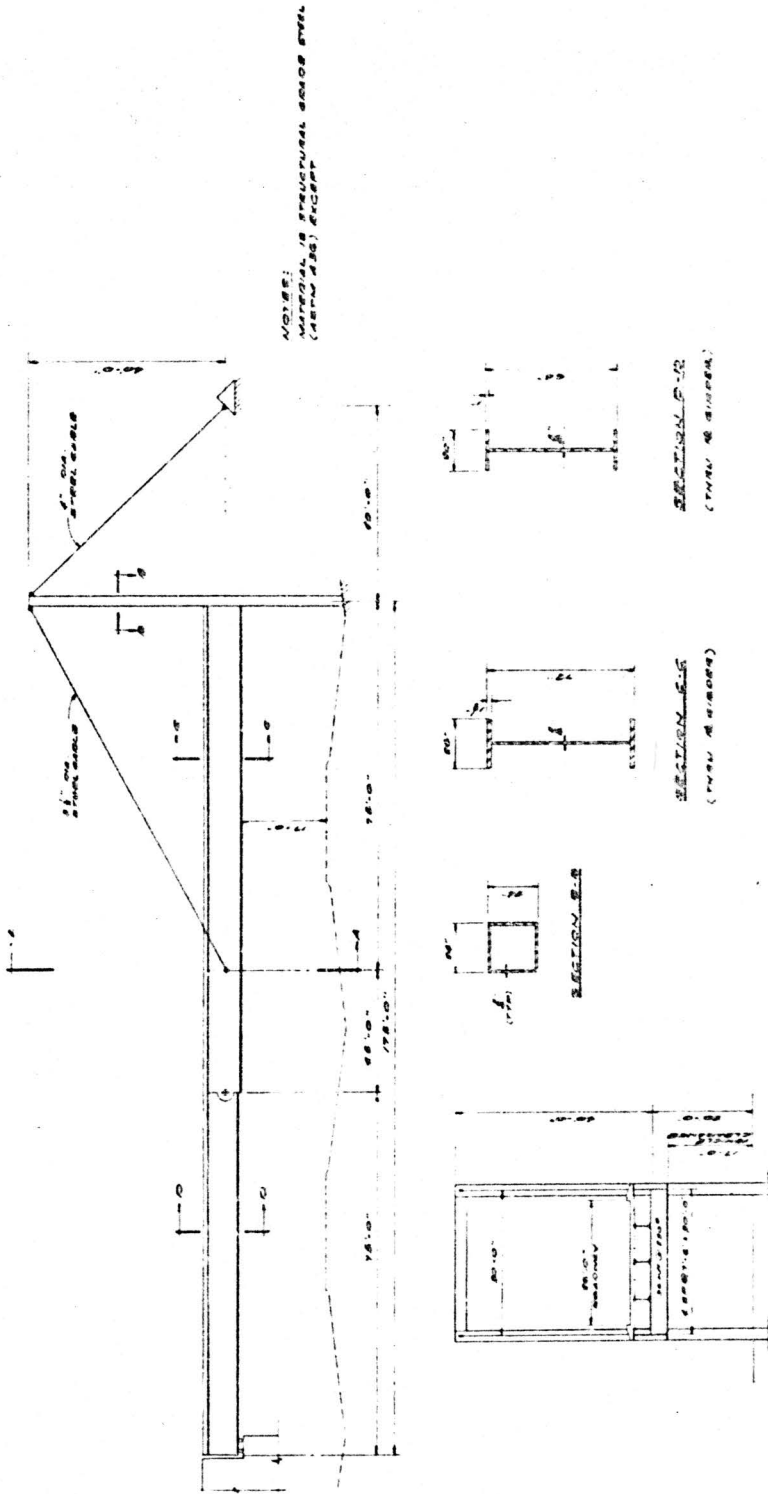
PRELIMINARY DESIGN DRAWING OF BRIDLE BRIDGE
